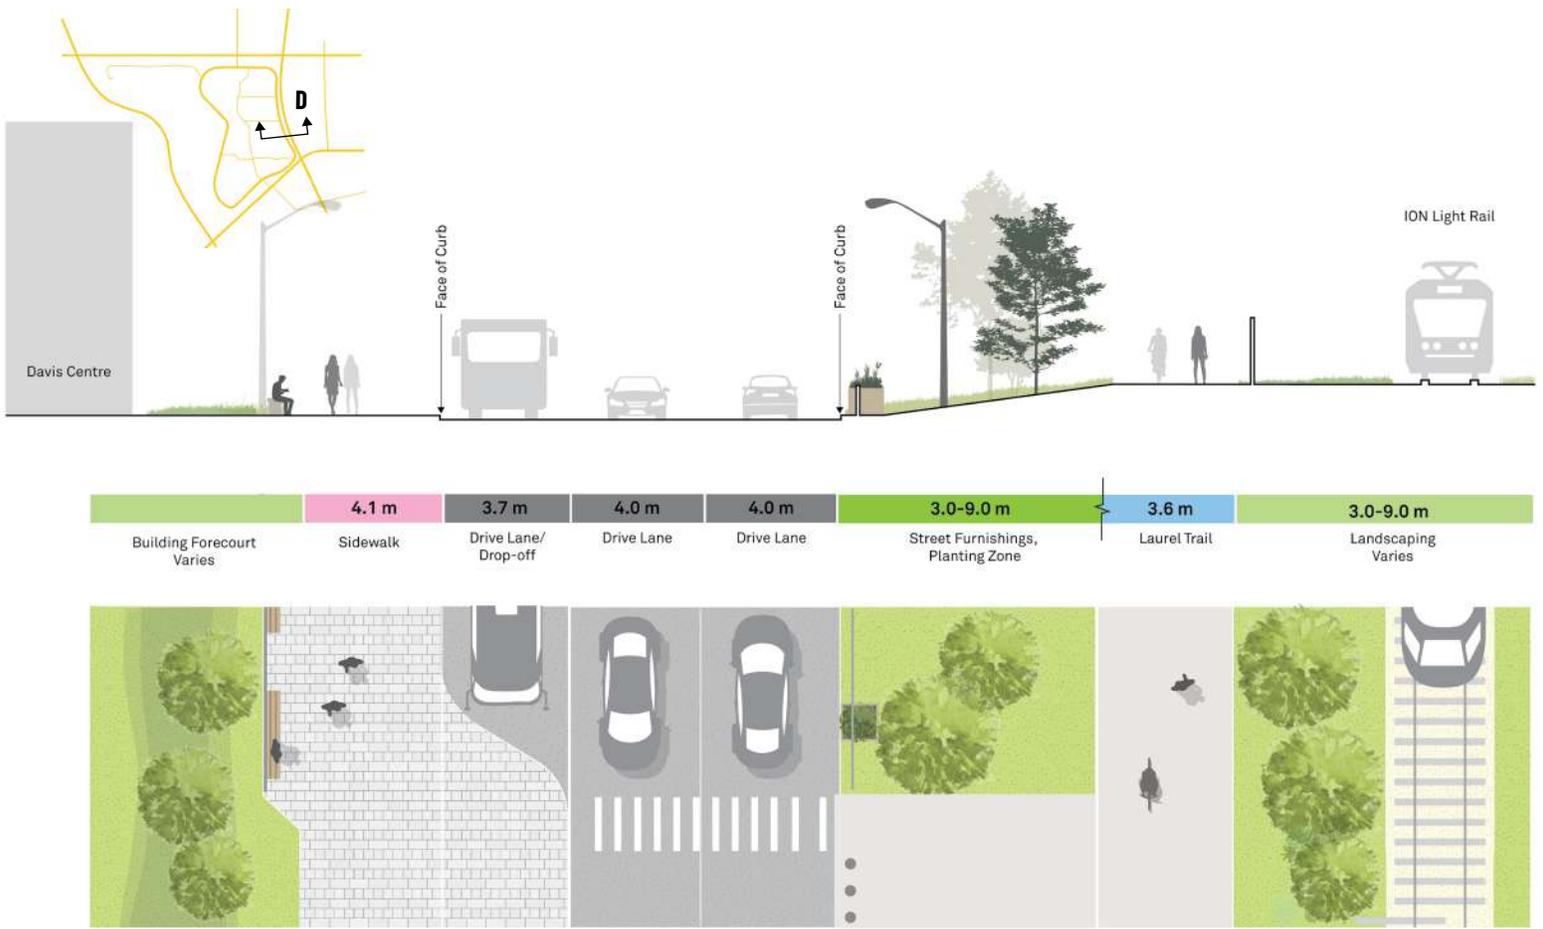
Section D. Existing condition of Ring Road (eastern edge).
